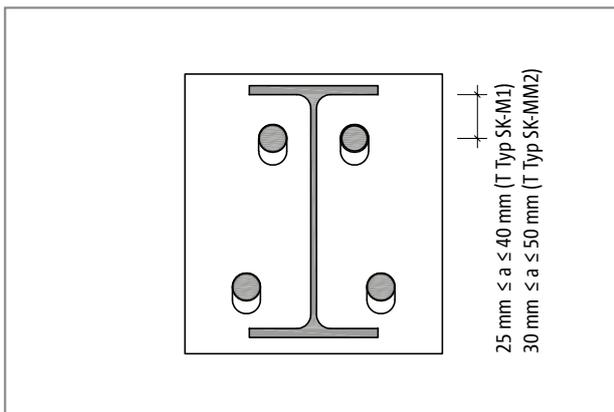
Schöck Isokorb® T type SK-MM2...-H200: End plate connection to IPE220 beam.
